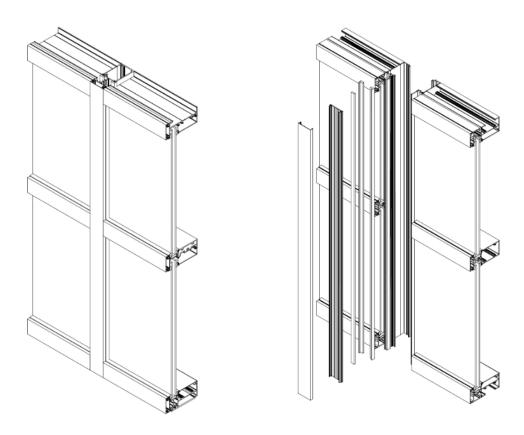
Kawneer 1600 Wall System 5 Type "A" Assembly (left) and Kawneer 1600 SS unitized curtain wall system (right). Adapted from "1600 SystemTM5" Kawneer Inc. (2013), and "1600 SS Curtain Wall", Kawneer Inc. (2014).
